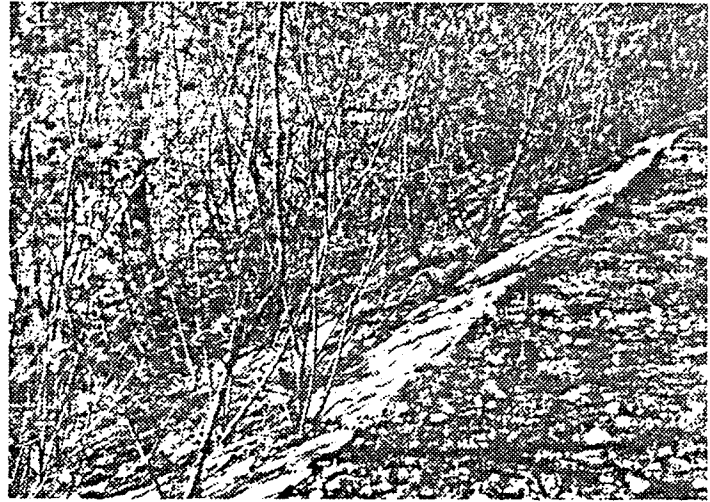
Four year old joint planting in a bank stabilization construction. Note that no deformation of the rock paving has occurred.
